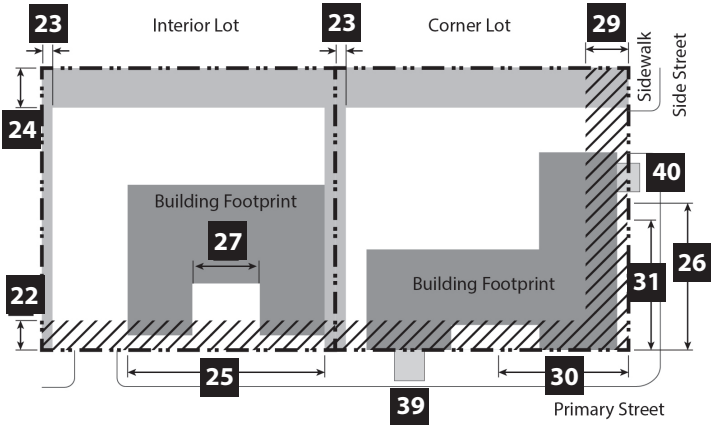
Building placement example diagram. Not to scale.
